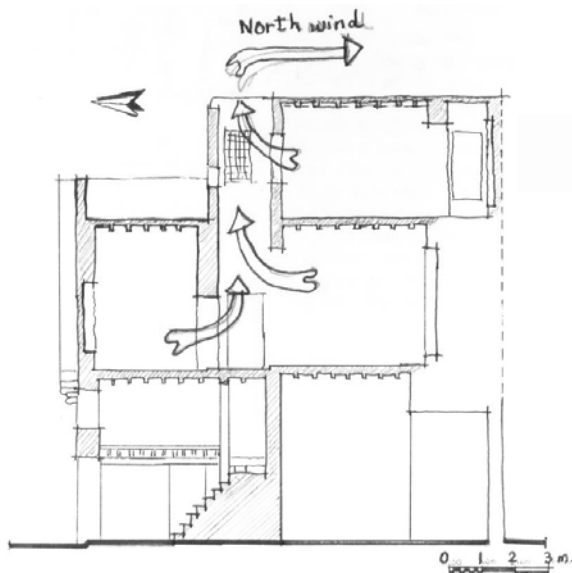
North South section in Bayt Waqf Raḍwan, (17th century), al- Darb al-Aḥmar, showing use of al-manwar to ventilate the house
